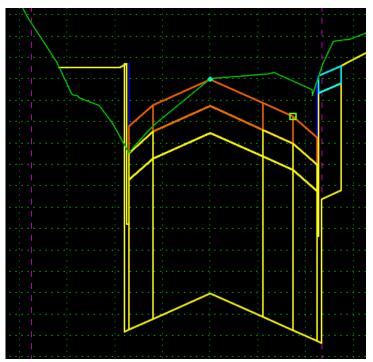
Roadway Designer - ROW Lines in Cross Section View
